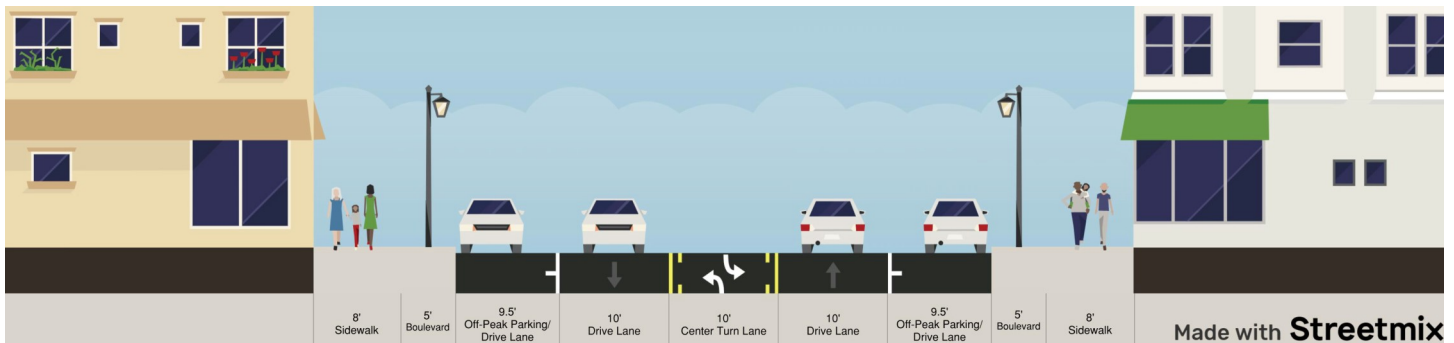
Robert Street Existing Roadway Cross Section– Click image to enlarge
